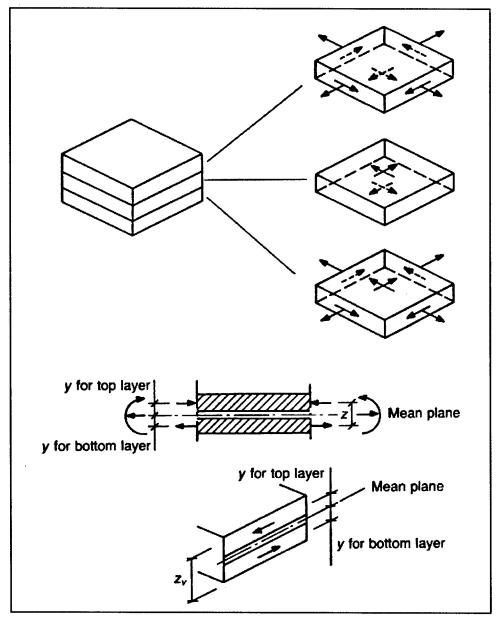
Equilibrium approach–sectional forces are resolved into membrane forces in sandwiched layers
